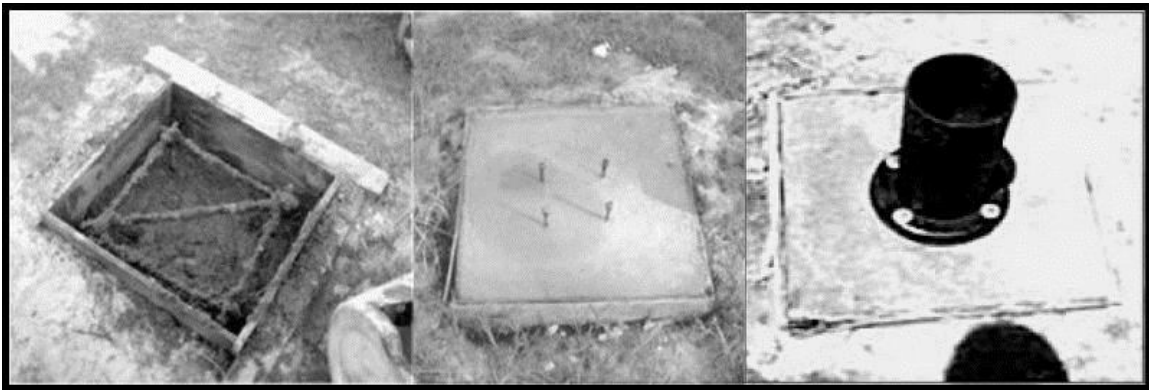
LEFT: 5000-PSI fast setting concrete pour in progress. Constant mixing with shovel eliminates air pockets. CENTER: Concrete poured and smoothed, with anchor bolts in place. Bolts were inserted into plywood frame that had been marked with proper layout for bolting steel pier in place. RIGHT: 18" high, 6-inch I.D. steel water pipe pier welded to 12" diameter automobile engine flywheel. Holes were drilled in flywheel before welding to pipe.
